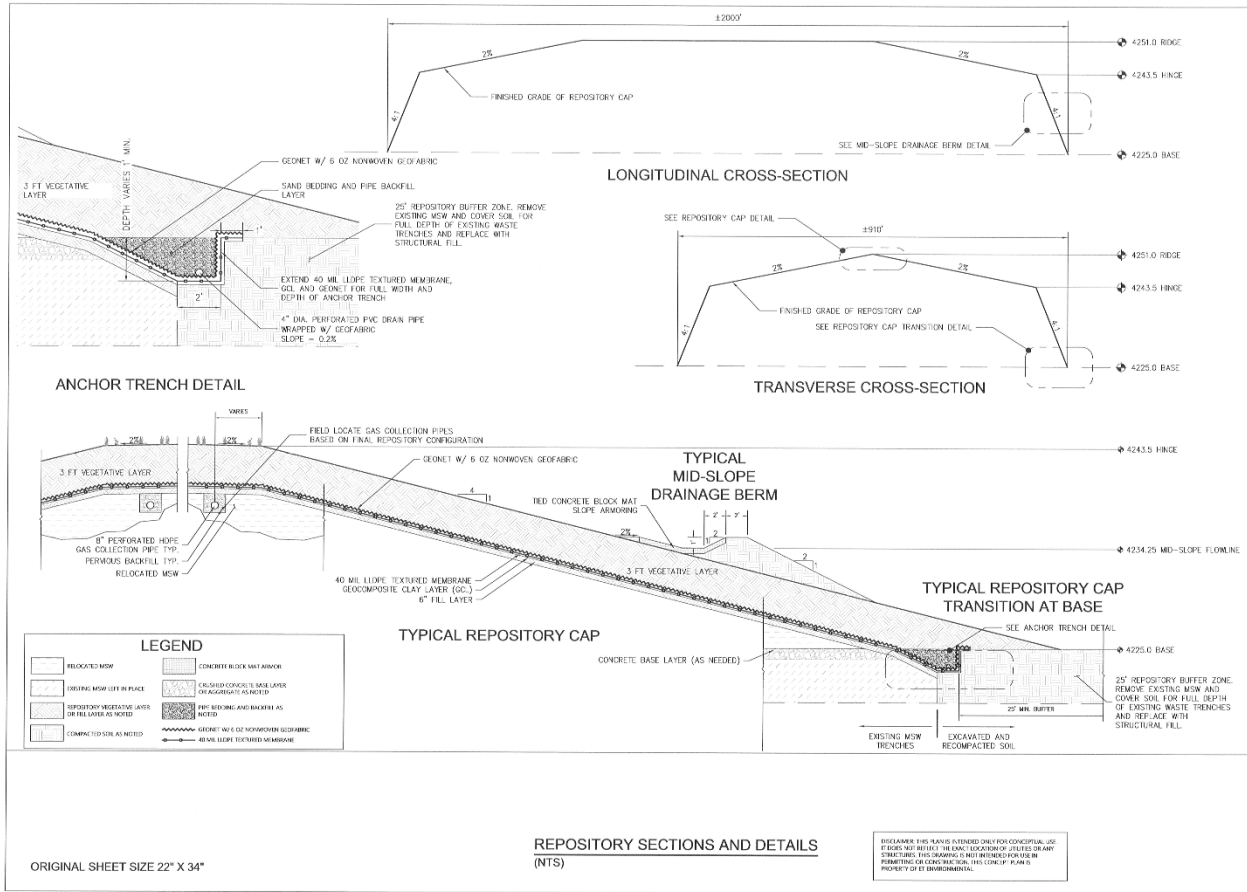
Repository Sections & Details (See Also Appendix A-24)
